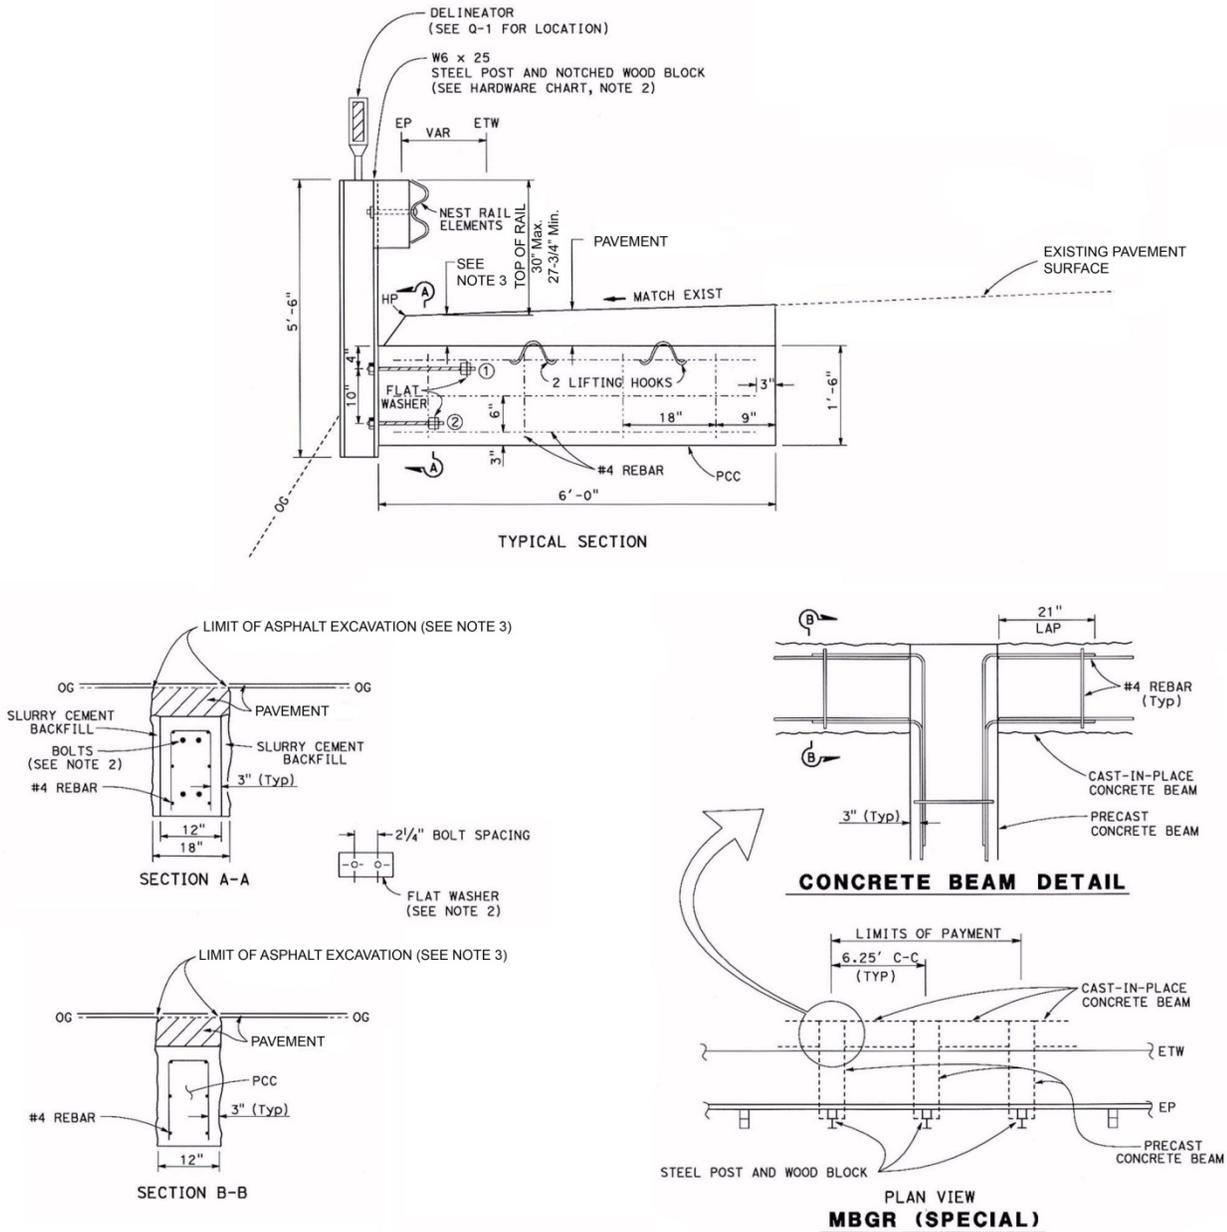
Guardrail Concrete Beam on Narrow Embankments
